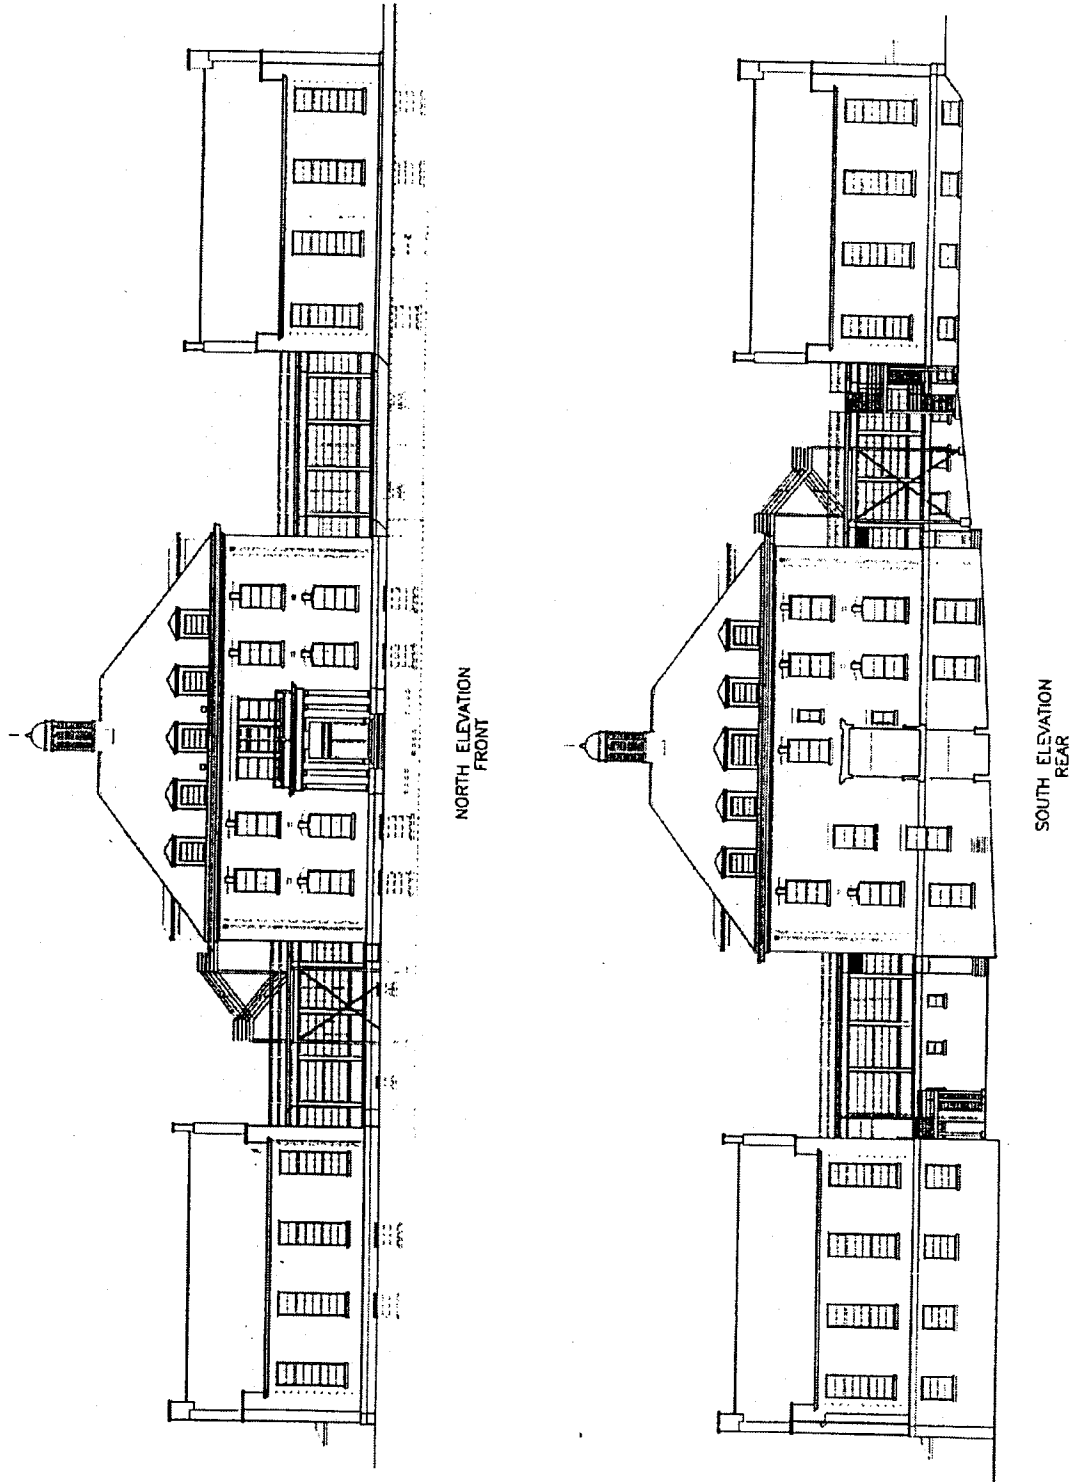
Figure A Building 3. North and South Elevations. These elevations represent the conditions of the building as they existed in 1994.
